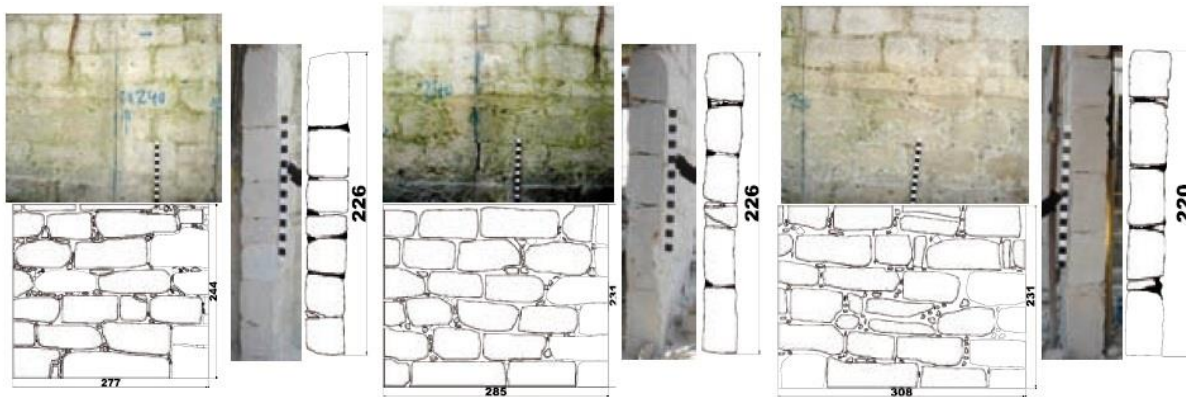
Elevations and cross-sections of walls surveyed in Porto [57]
